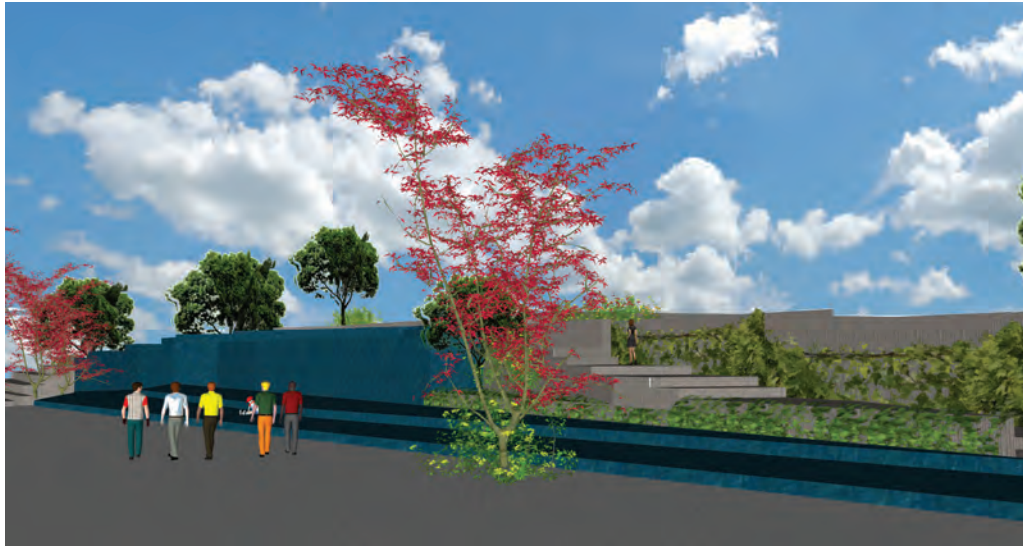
Streetscape section showing welcome sign at southern gateway (Hwy 101 exit) to First Street
